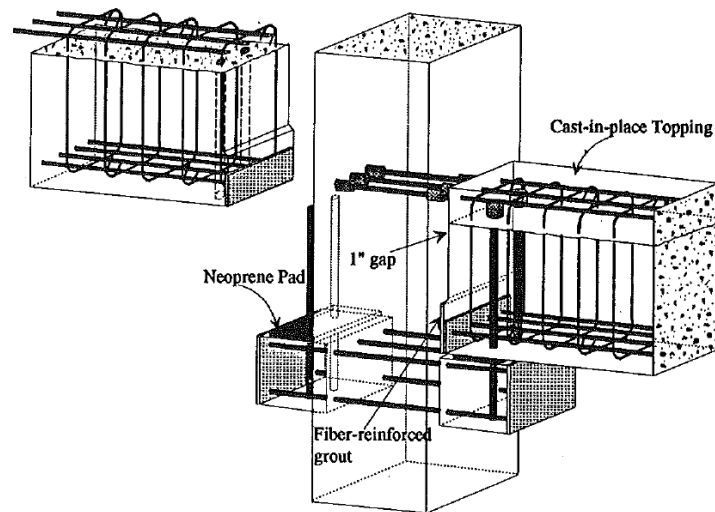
UT-GAP connection detail (Palmieri et al., 1996).
